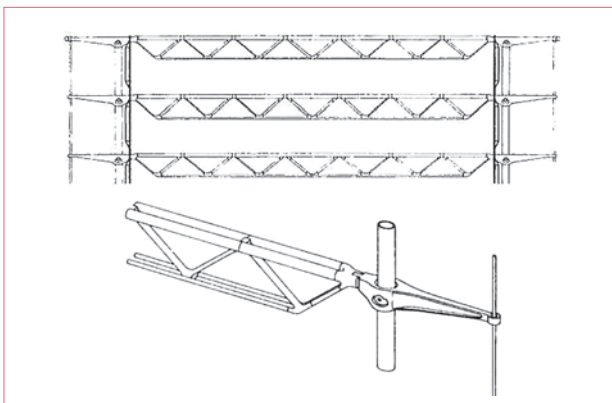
Cross-section model and detail showing the relationship between the main truss, the *gerberette*, the pillar and the tension rod
